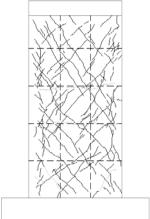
Cracking drawing of wall MEN50C at a drift of 1.4%.
